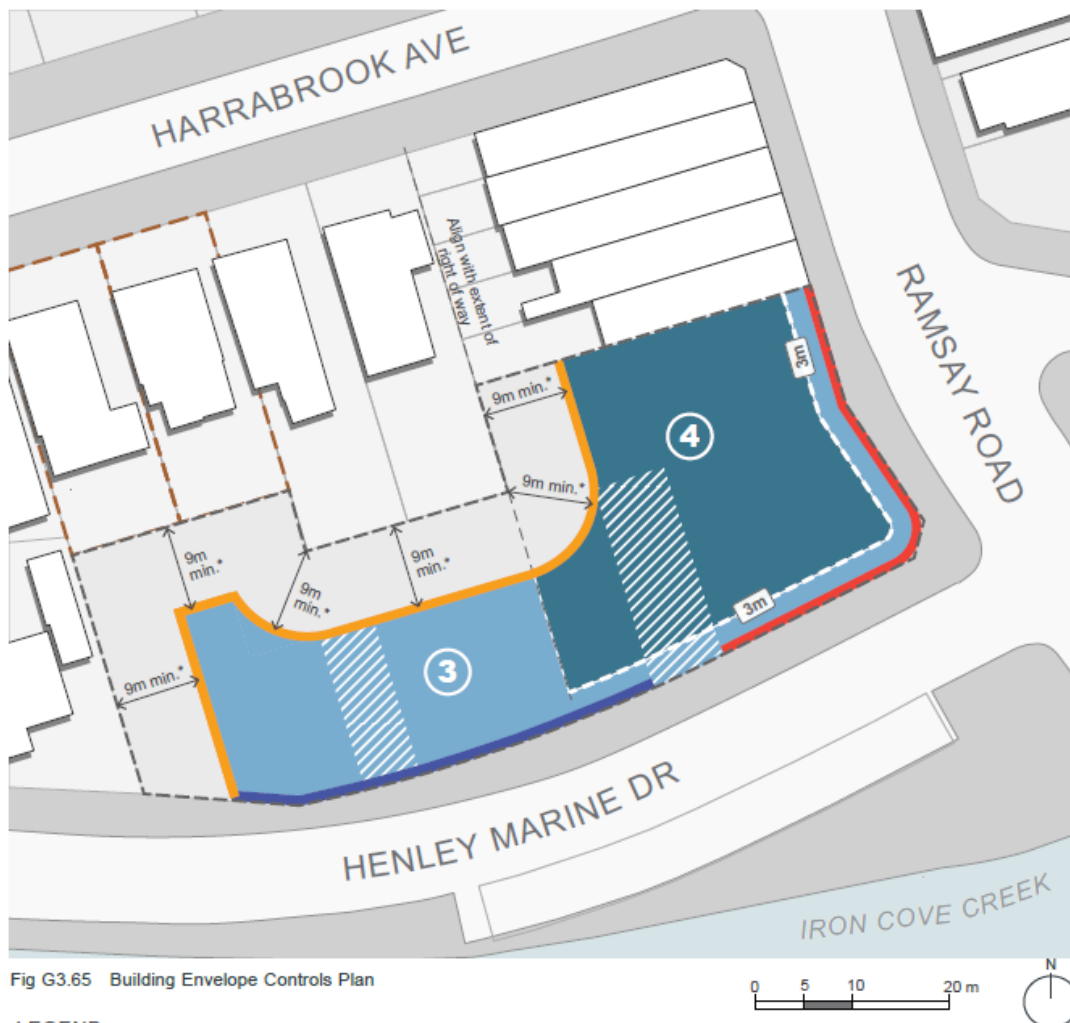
Recommended Building Envelope Plan (Source: Draft DCP)
